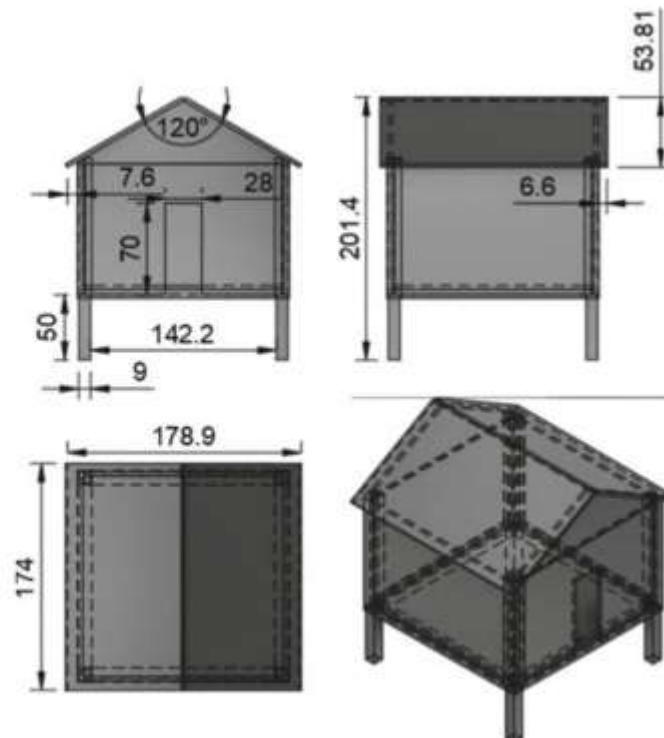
Schematic drawing of front, top, and side views for model TMH representing Assembly A and B
